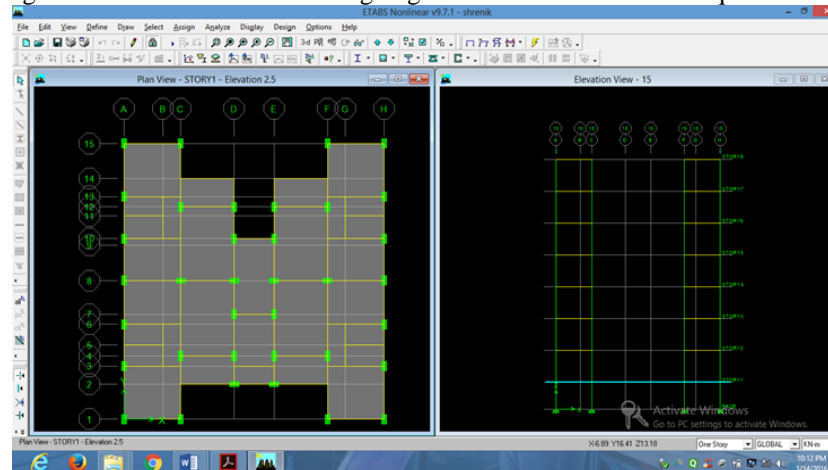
Floor plan of under consideration residential building created in ETABS Software
